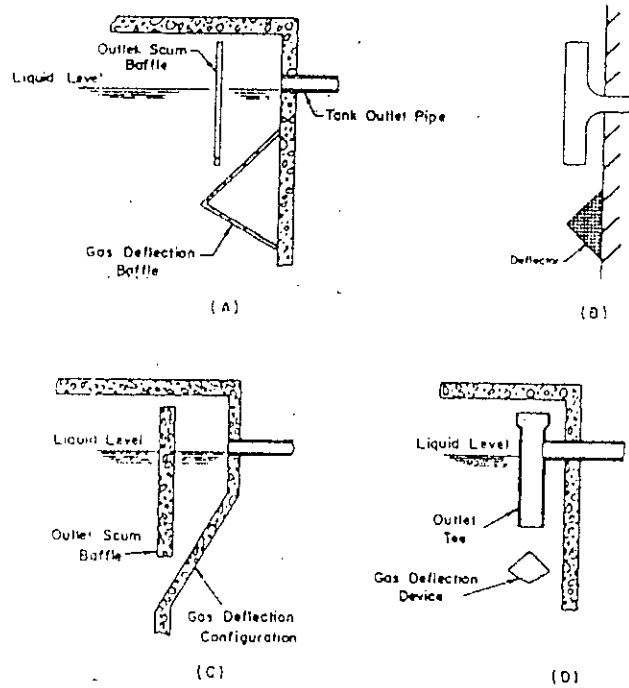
Typical Sludge and Scum Deflectors At Outlet
